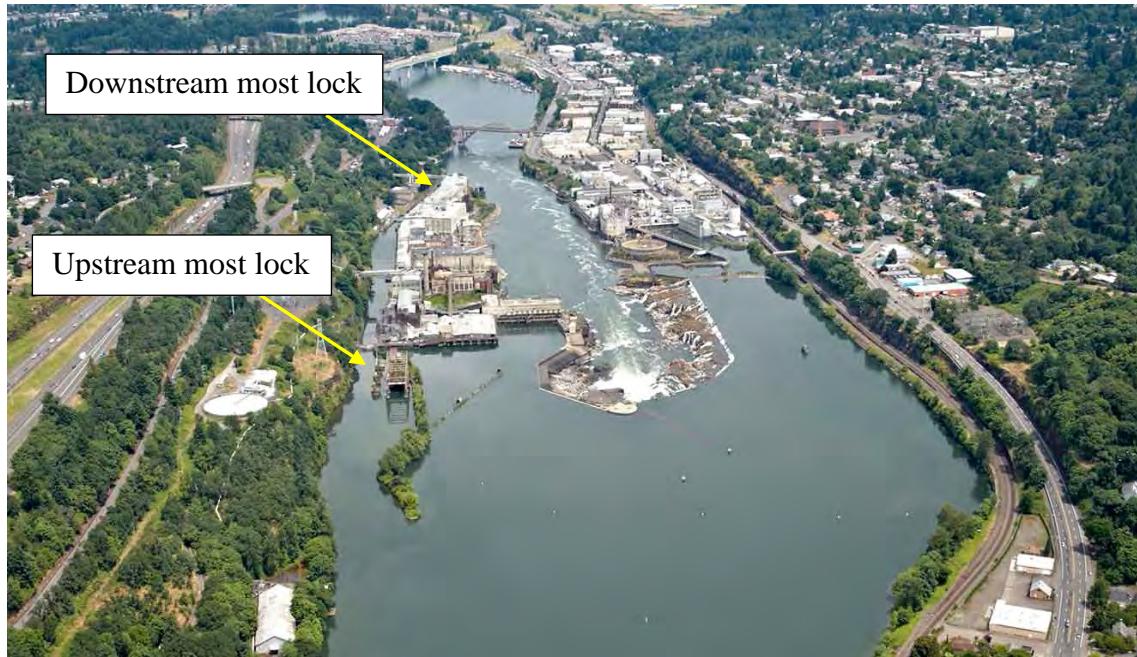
General Aerial Photograph of Willamette Falls Locks and Surrounding Area
